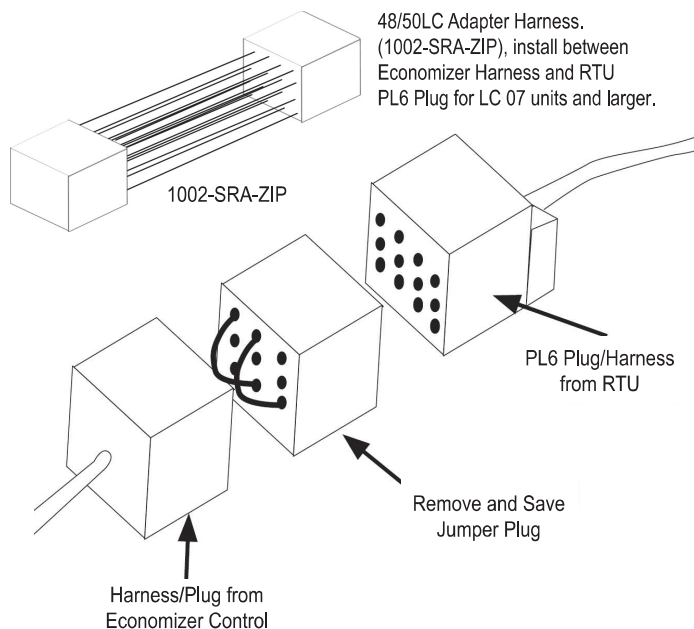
PL6 Plug Located in the RA Cavity with the Economizer
